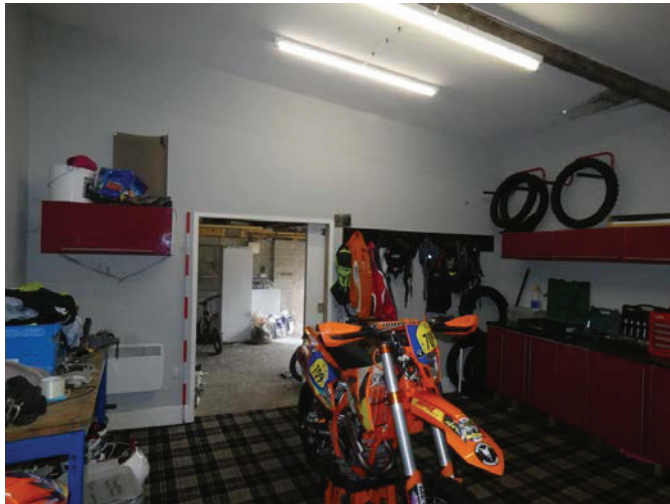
(right): The south-east elevation, Room 2, viewed from the north-west
